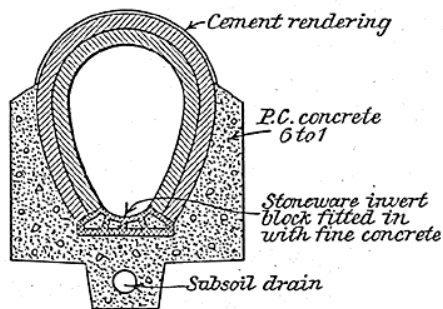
Section of Egg-shaped Sewer, showing use of Invert Block and Subsoil Drain.
